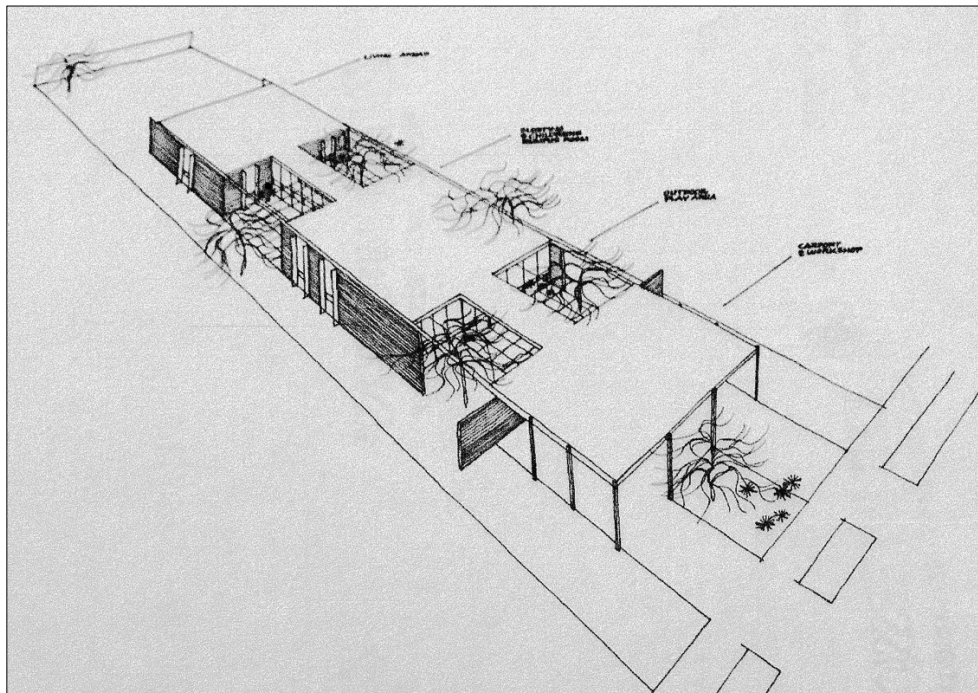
Sketch of the proposed house, March 1963. Note that it differs from the plans as built – refer below. Source: - RMIT Joyce/Nankivell archives, provided by the owners.
